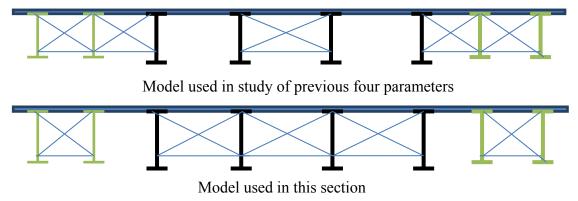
Difference between models used for bridge SR-589 over *Waters Avenue* in this section and previous sections
